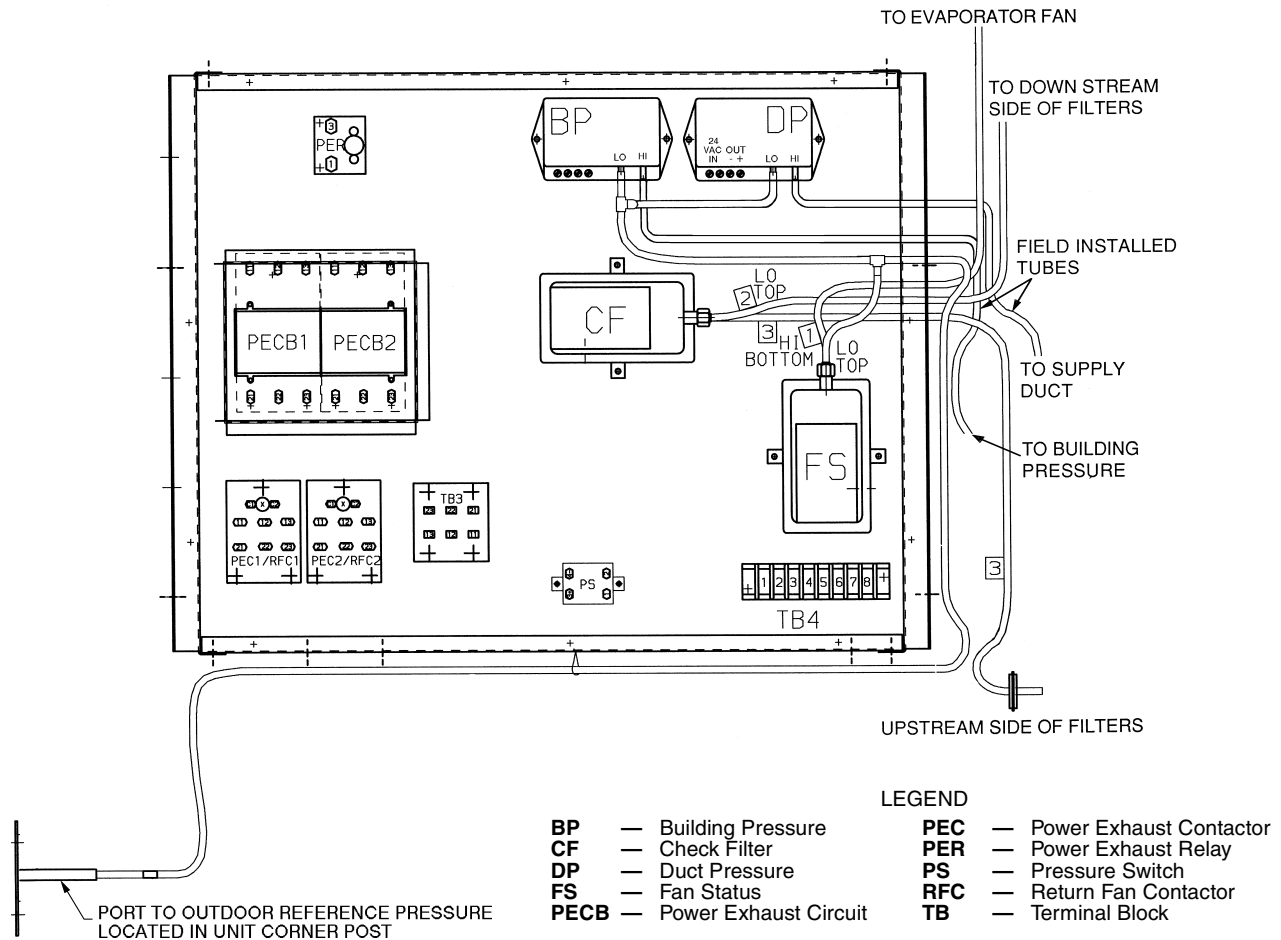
Auxiliary Control Box Details; Size 055-105 Units
